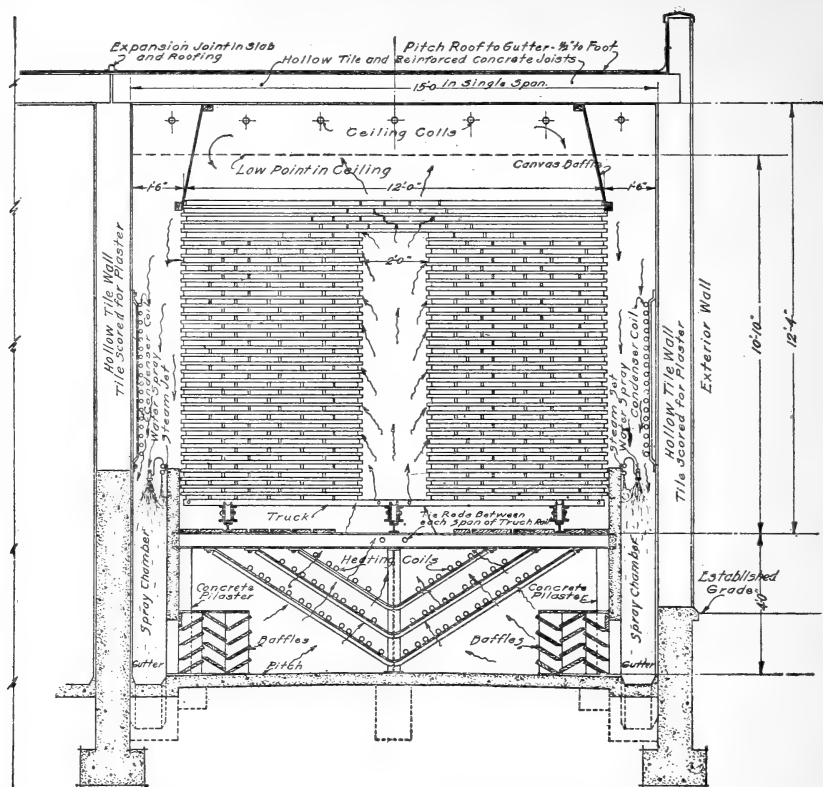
Typical cross section. Tile walls, concrete spray chamber, concrete and tile roof. Flat open piling.
